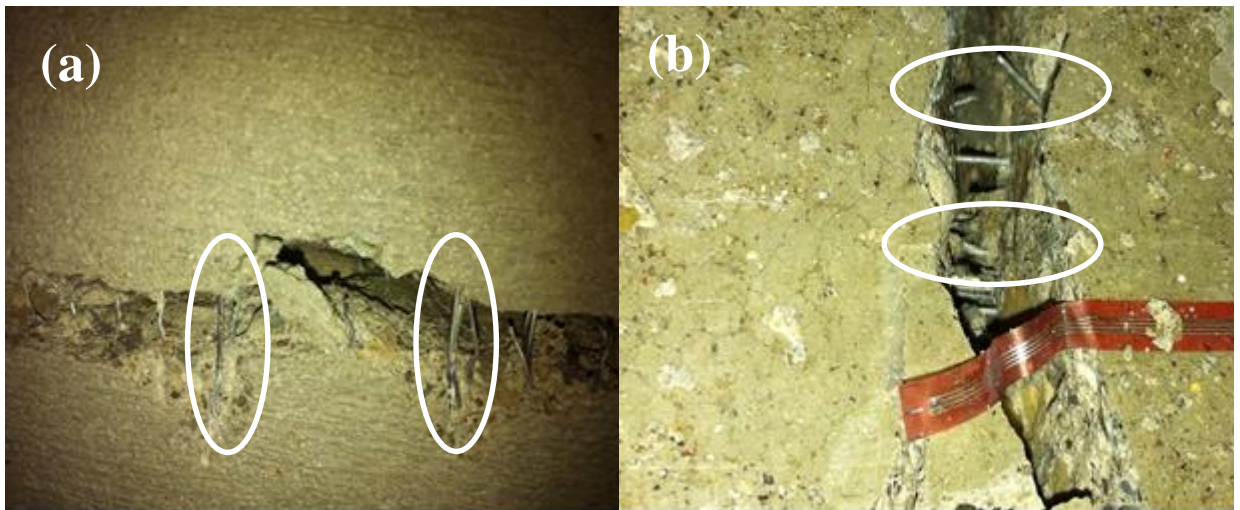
DCSFRC failure mechanism: (a) fibres pull-out, and (b) fibres rupture.
